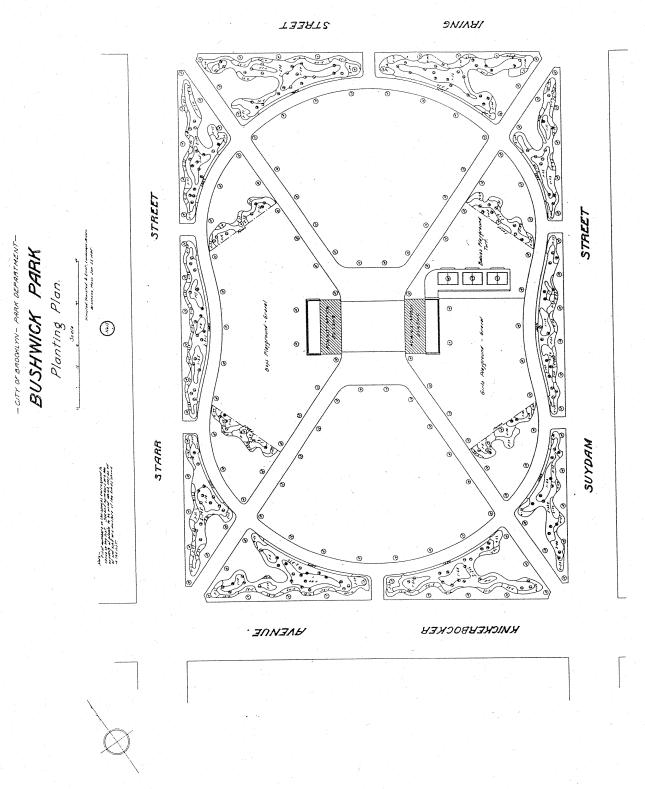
Bushwick Park Planting Plan, City of Brooklyn, Park Department, Olmsted, Olmsted & Eliot, Landscape Architects, Brookline, Mass., Jan. 22, 1895. Courtesy Beveridge collection.
